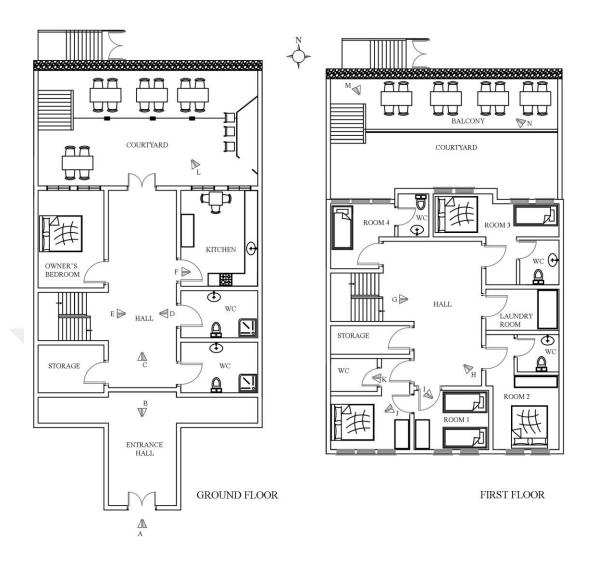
"Antik Otel", ground and first floor plans (S.Sevimbige arşivi, 2017)
